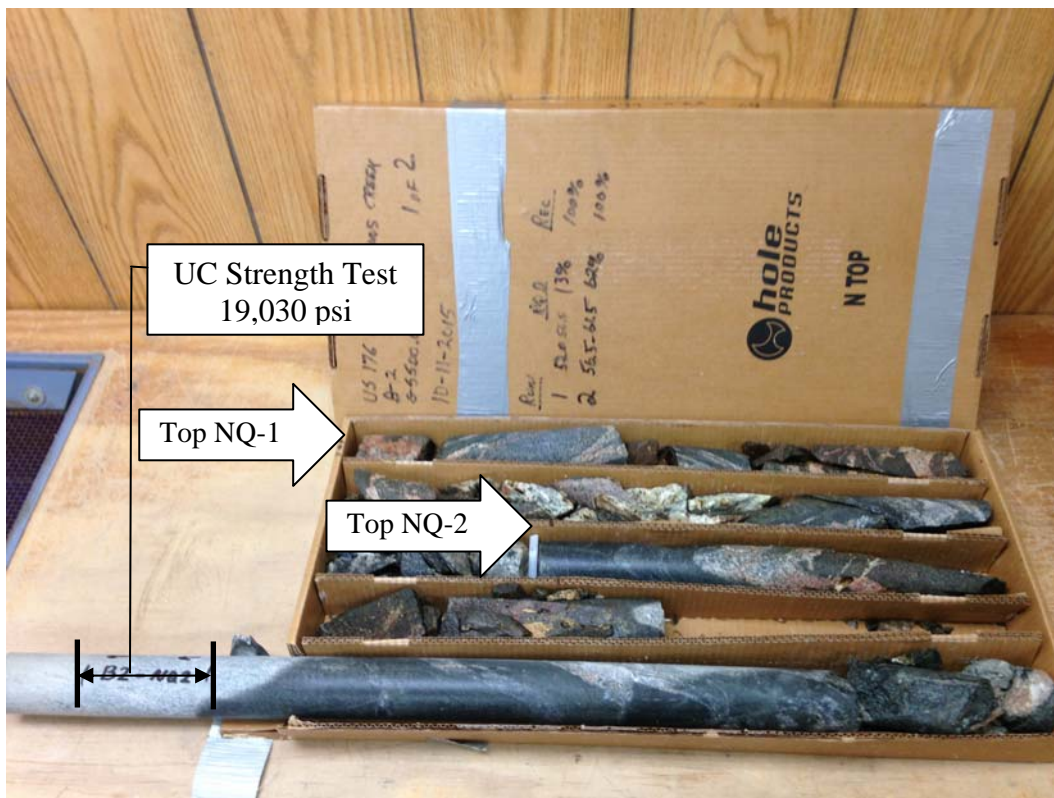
B-2 Rock Core Specimens NQ-1 & NQ-2
